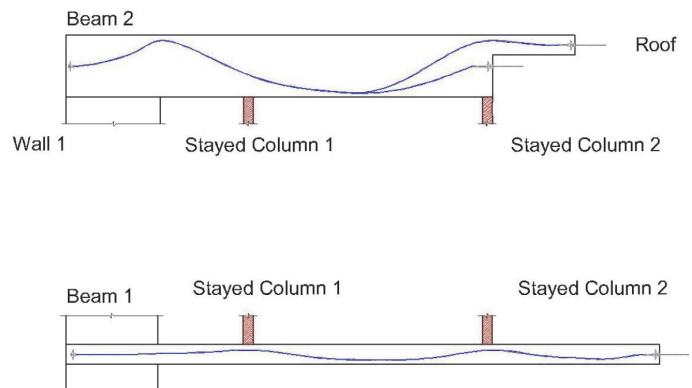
Tendon profiles in Beam 1 and Beam 2.
